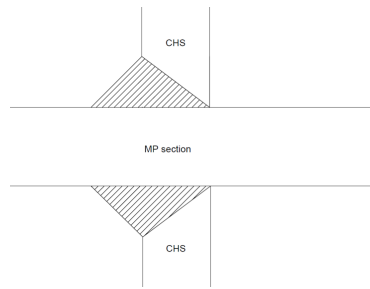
sketch of the weld between the slotted stubs and the MP section
